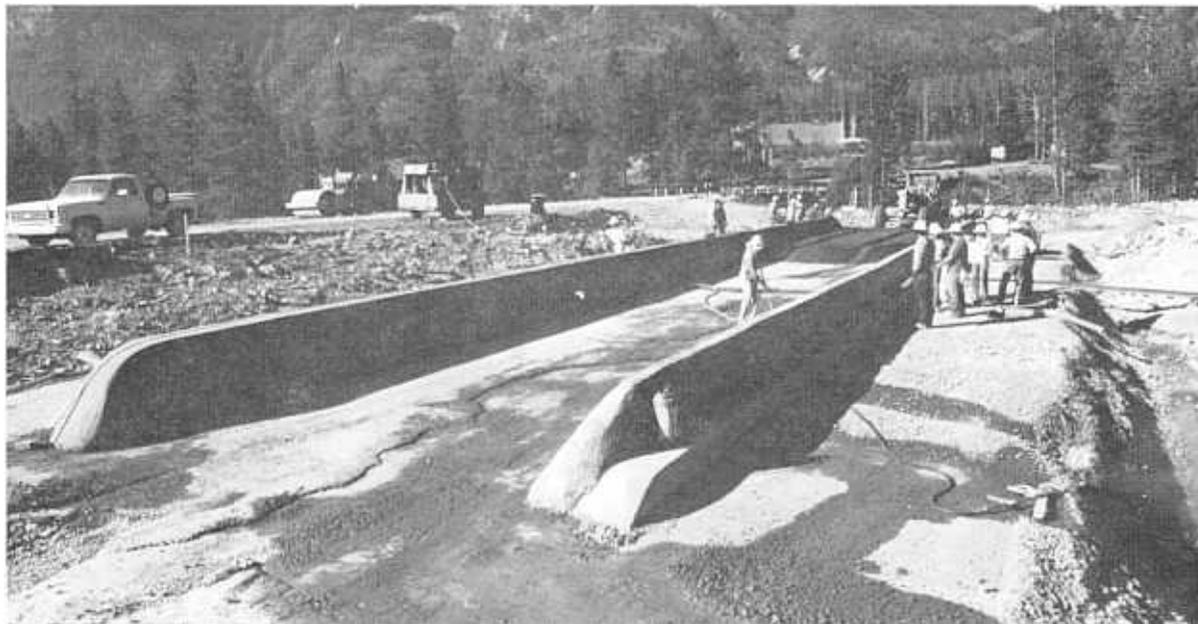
A. – Three-foot-high upstream and downstream facing elements in place prior to placing two 1-foot-thick lifts of RCC. Facing elements serve as forms for RCC. P801-D-80882
